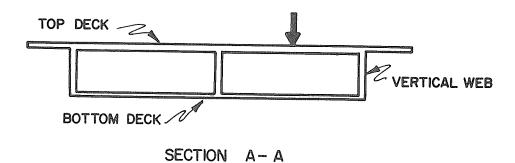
FIG.I BOX GIRDER BRIDGE EXAMPLE OF A CELLULAR STRUCTURE
